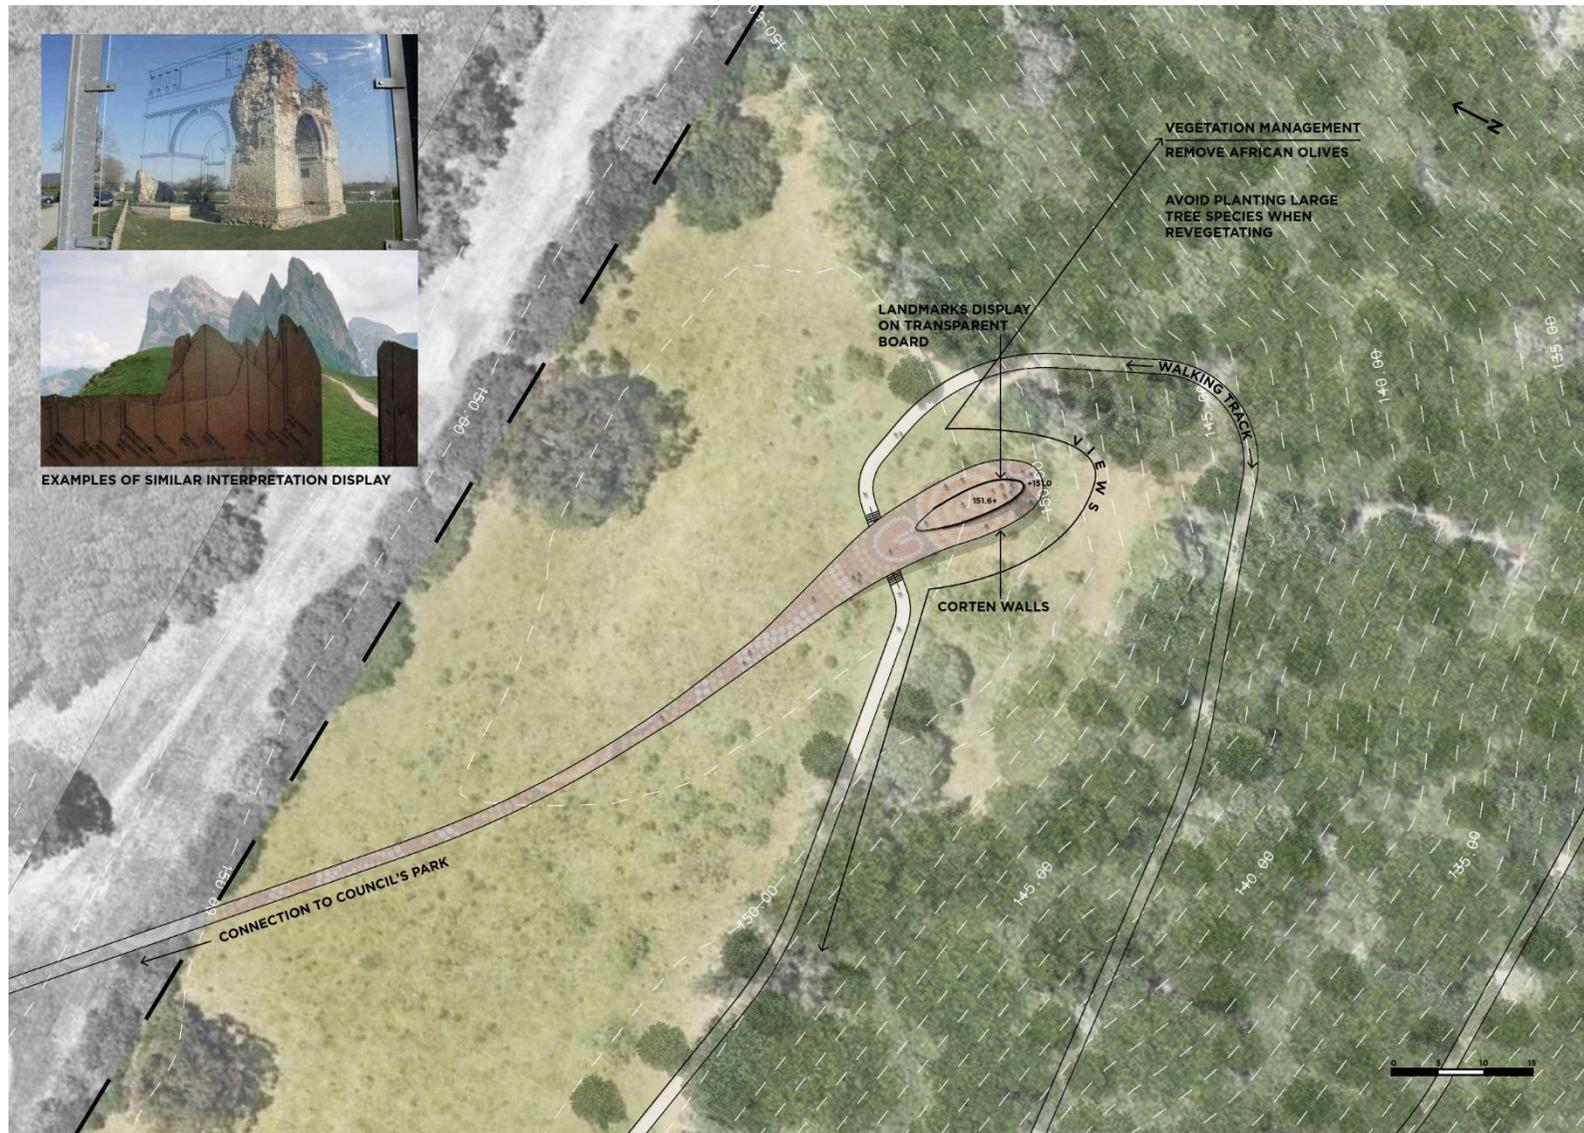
Proposed design plan for lookout platform and paths. Source. Florence Jaquet, Landscape Architect.
